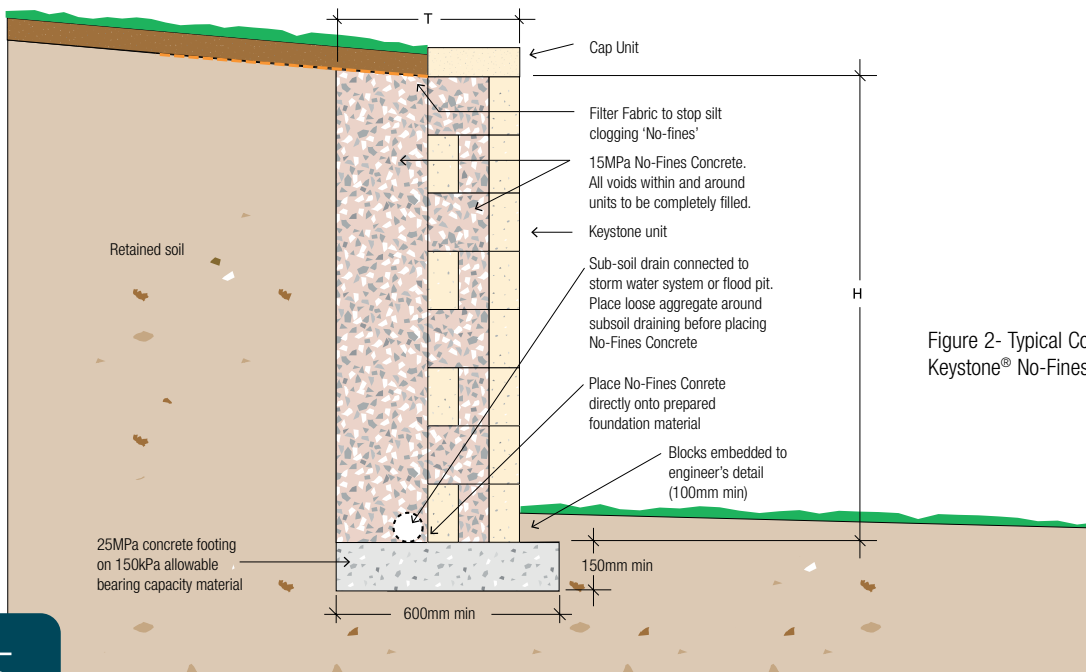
Typical Construction Detail - Keystone[®] No-Fines Concrete Mass Gravity Wall
